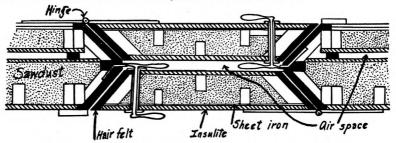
Detail of the Construction of the Doors of the Soundproof Room
